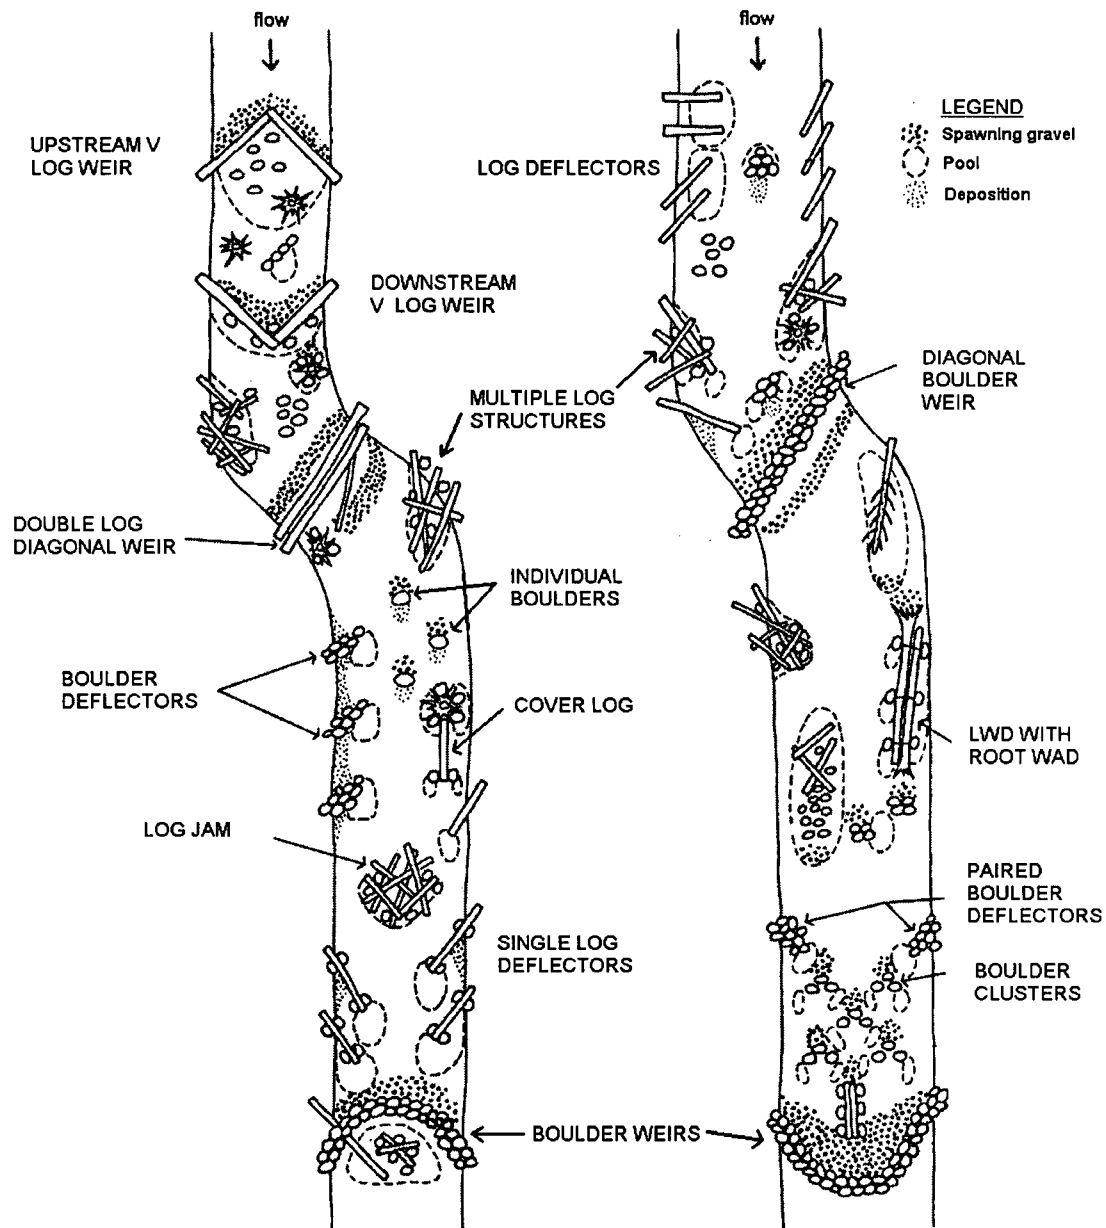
Typical stream rehabilitation structures (modified from Crispin, 1988)
